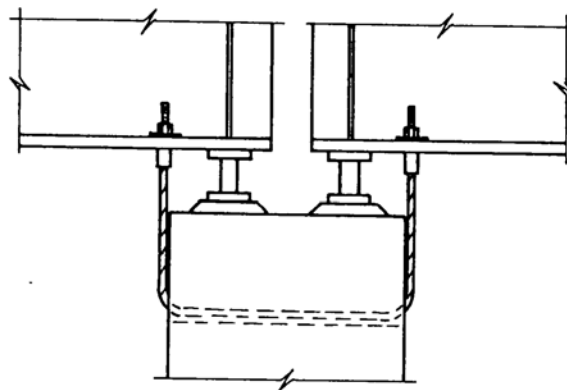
Typical Cable Restrainer for Uplift
